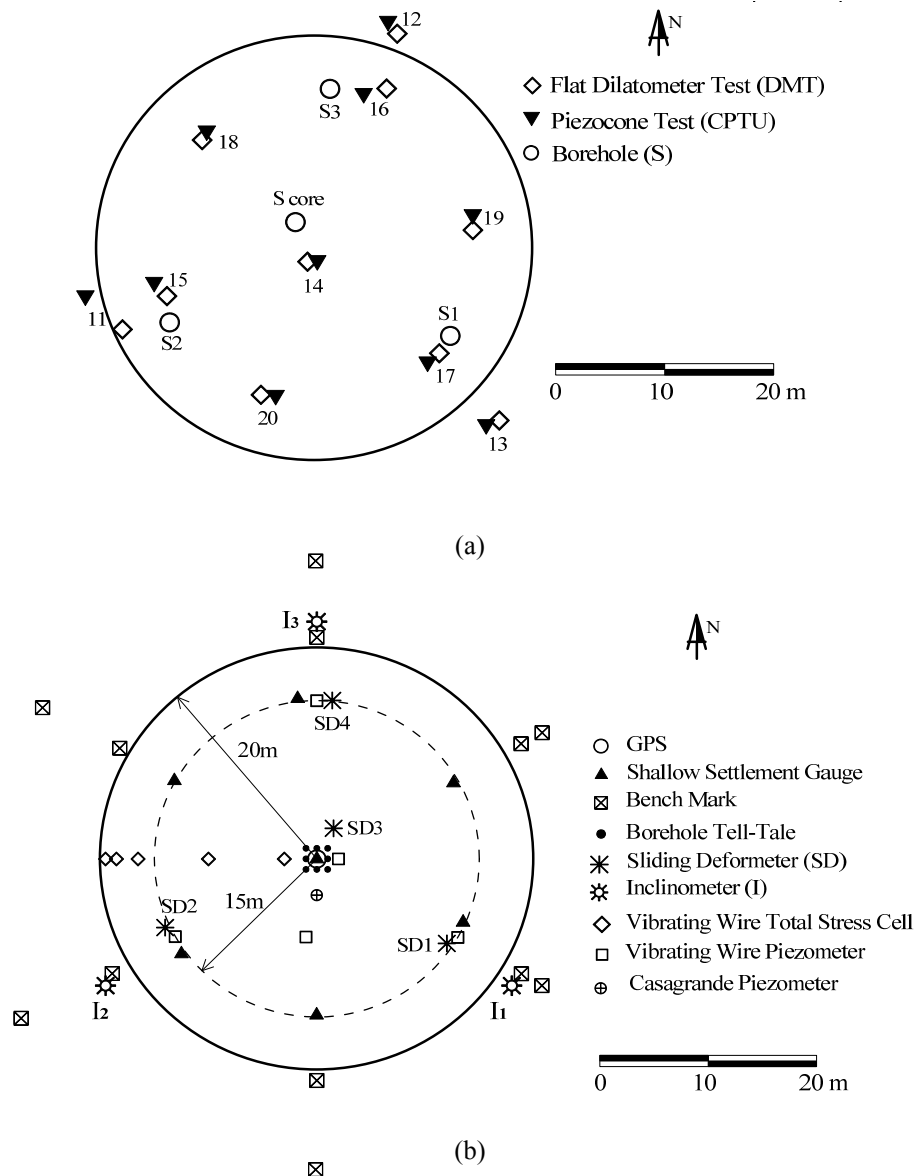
Plan of the embankment showing: (a) in situ geotechnical characterization; (b) monitoring instrumentation.
